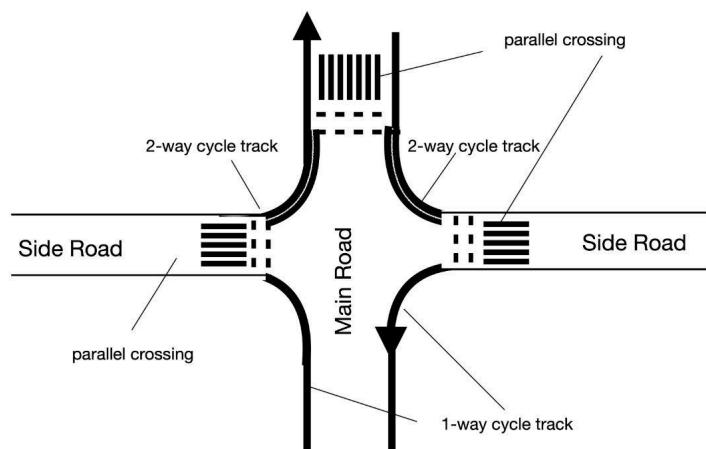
B: Priority cross road junction similar to York Way- Randalls Road junction but with parallel crossings over the side roads
